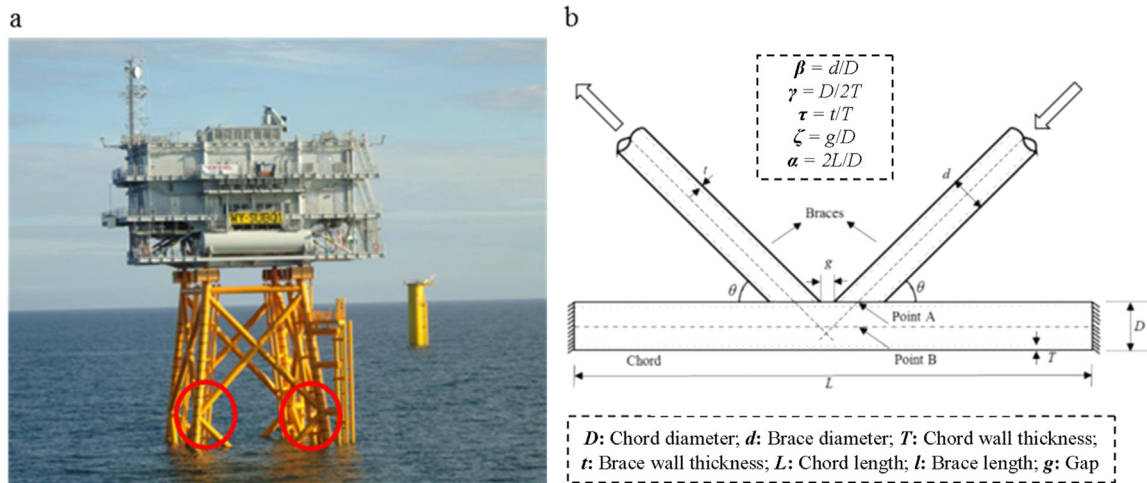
(a) Tubular K-joints in a jacket offshore platform and (b) geometry and boundary conditions of a tubular K-joint subjected to balanced axial loads.
